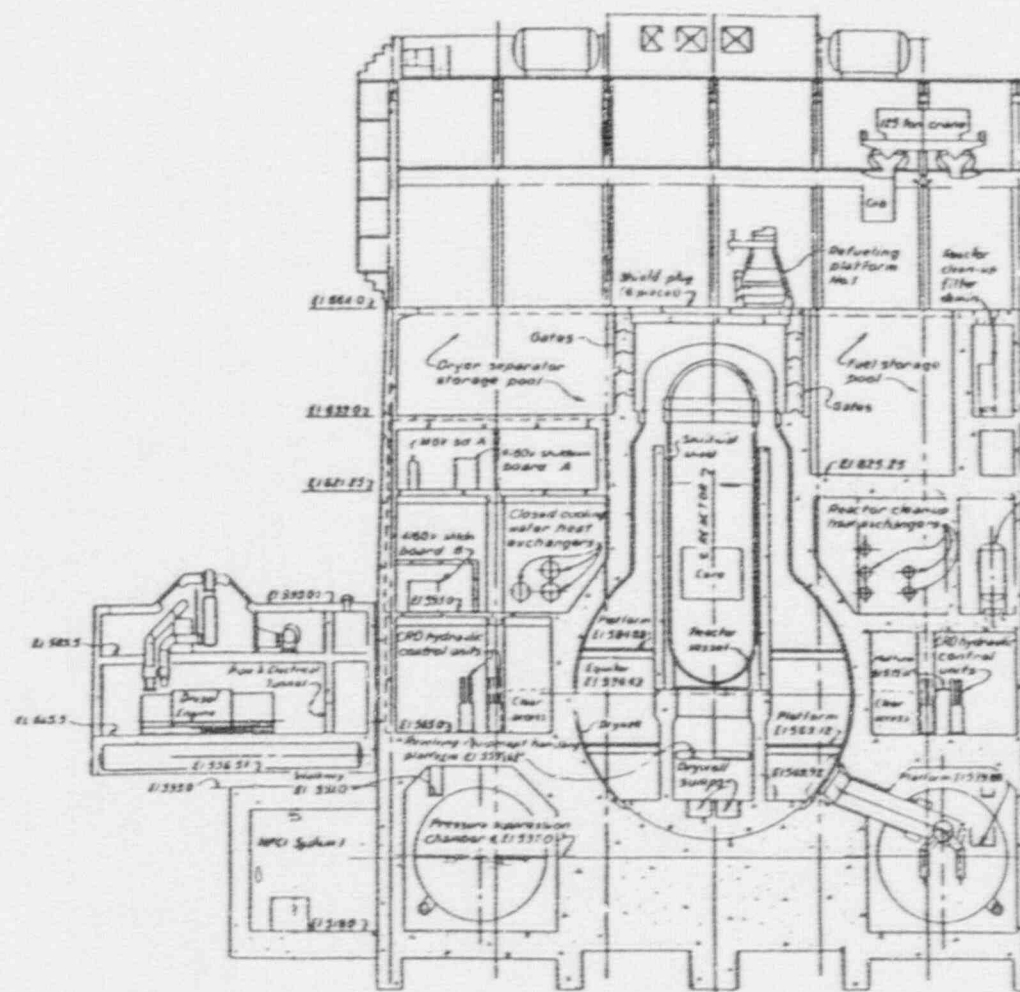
Browns Ferry Units 1 Reactor Building Elevation Drawing (section through reactor centerline), Including Units 1 & 2 Diesel Generator Building
